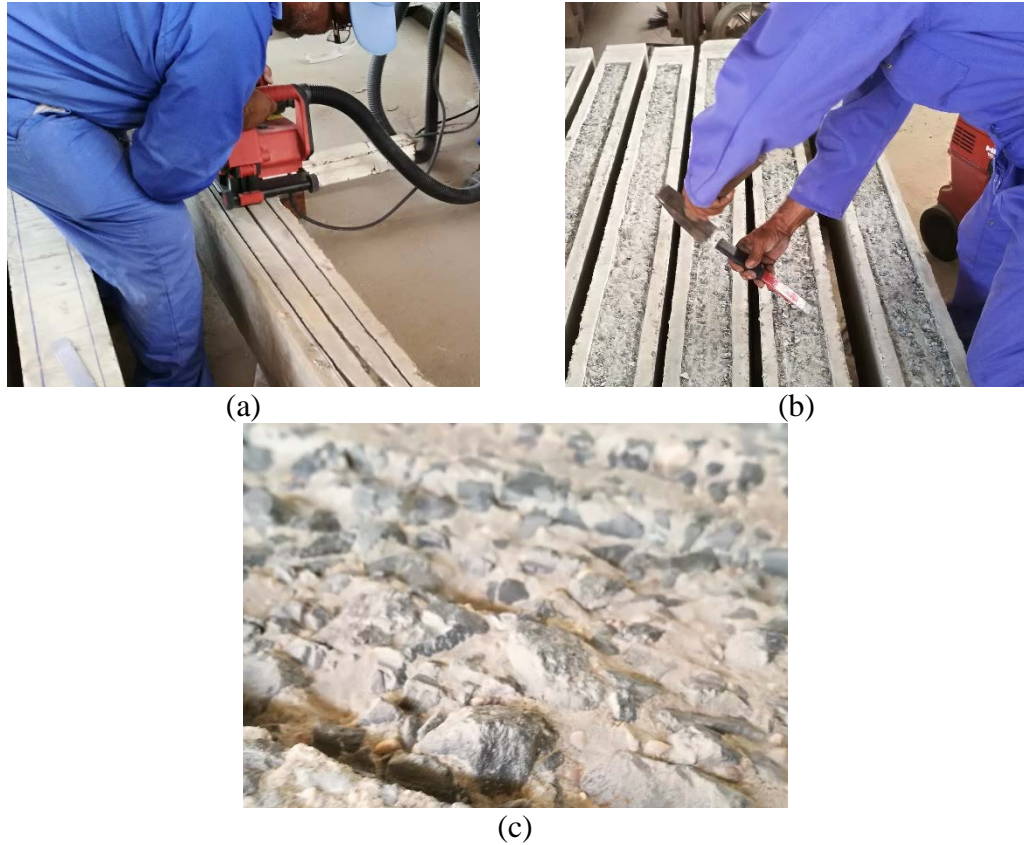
NSE beams preparation: a) Using slitting machine to cut the grooves, b) Manually chipping away the cut concrete, and c) Finished surface after cleaning
